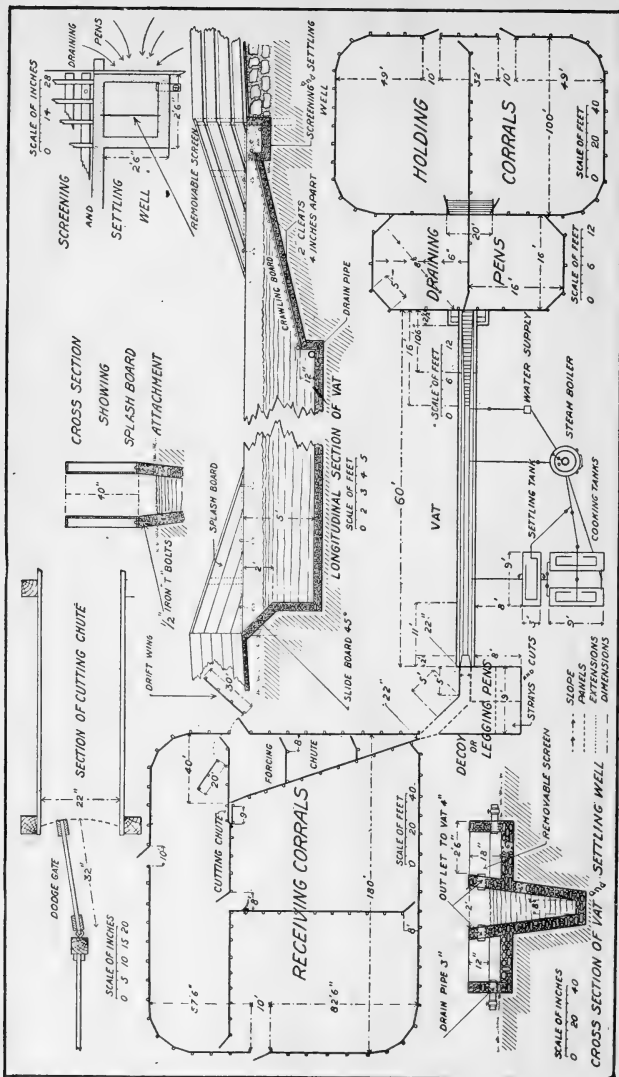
Plan of sheep-dipping plant; cement vat.
